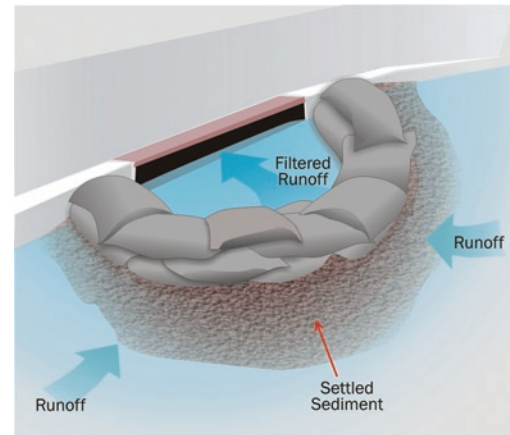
Illustration of a storm drain inlet with rock-filled bags filtering stormwater.
